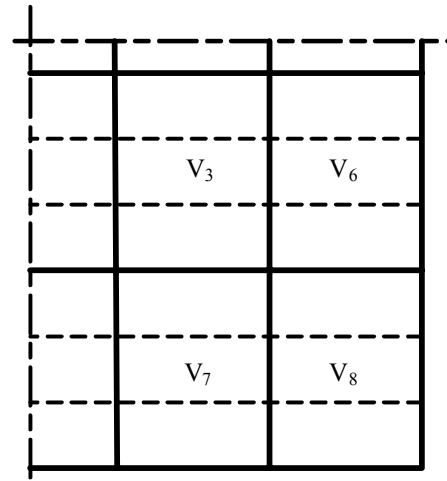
Layout of continuous slab panels in a typical floor plate. Labels correspond to analyses shown in Figure 11.
